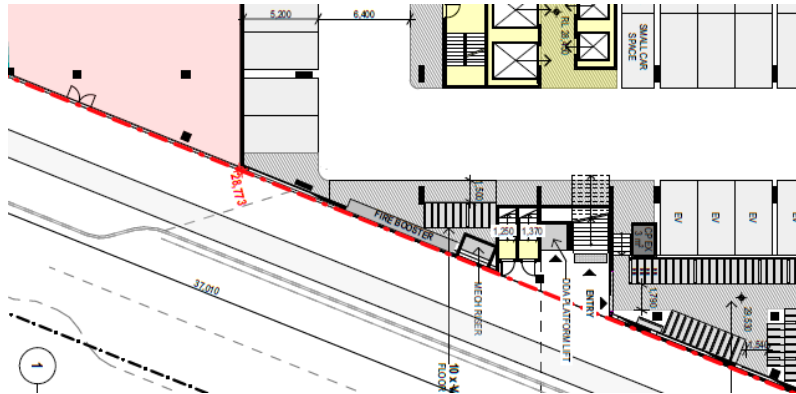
Existing Lower Ground Floor Plan- southern end east elevation
